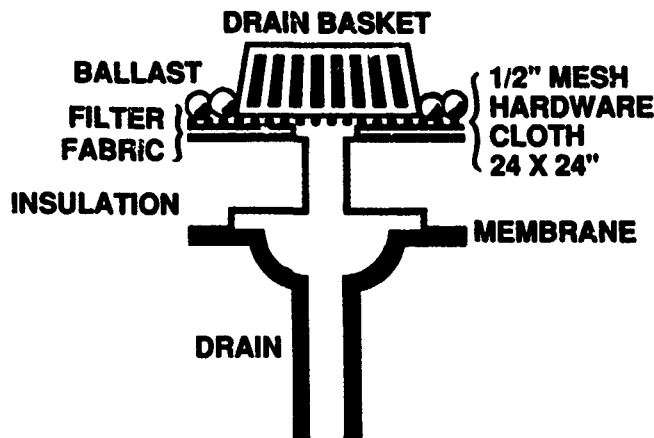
The drains of a protected membrane roof are insulated to prevent icings there.
